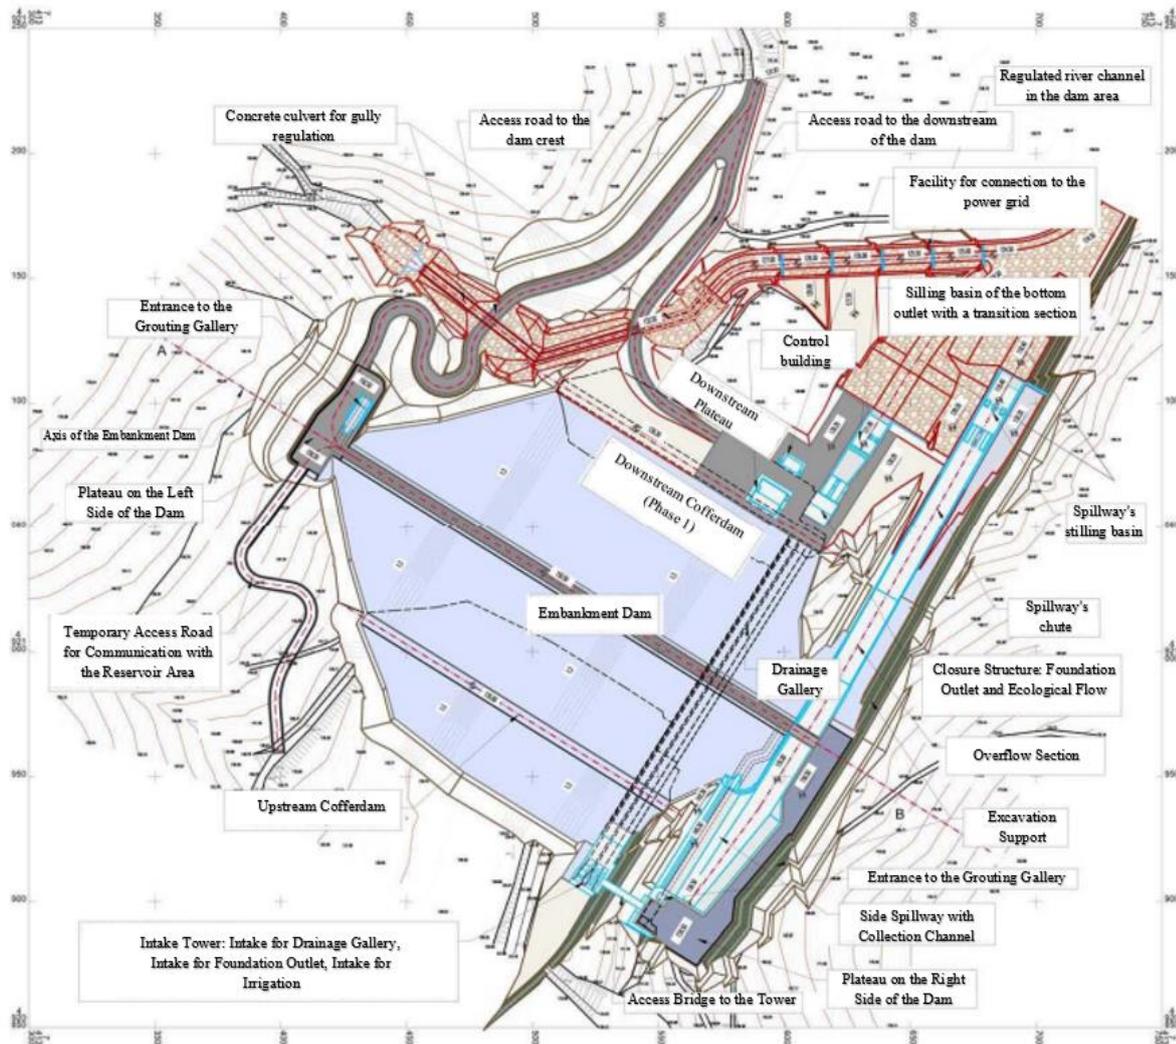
Layout of the Pambukovica Dam with key structural elements (Source: Design for Construction Permit)
